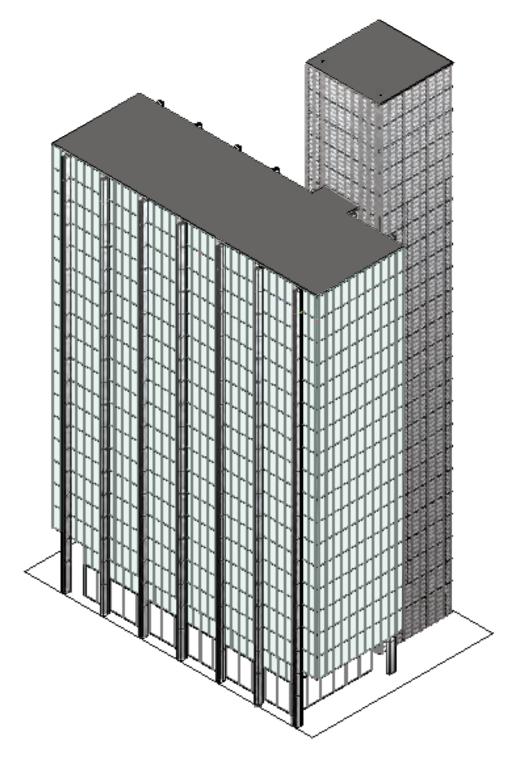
Existing Curtain Wall. Source: Autodesk Revit, the author, 2012.
